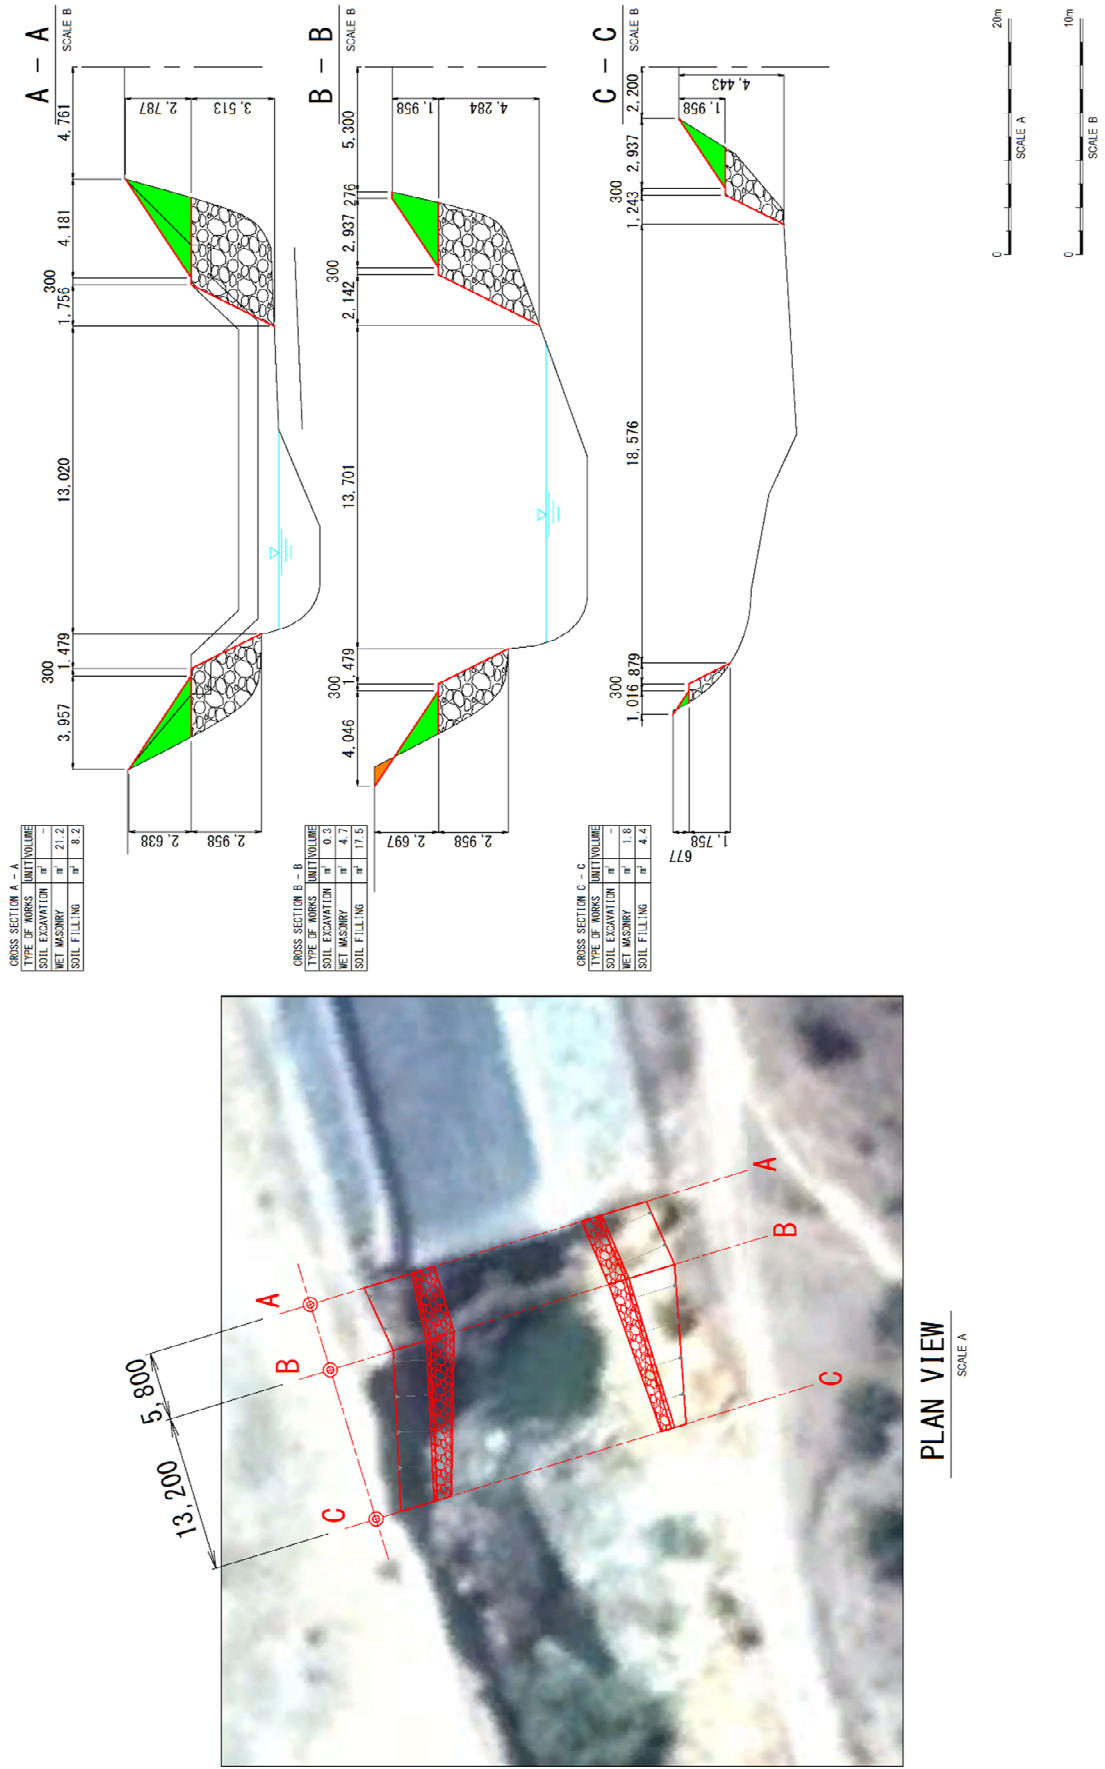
The Typical Cross-Section and Plan View of the Connection Canal with Protection Walls (Chinyamatumwa Dam)
